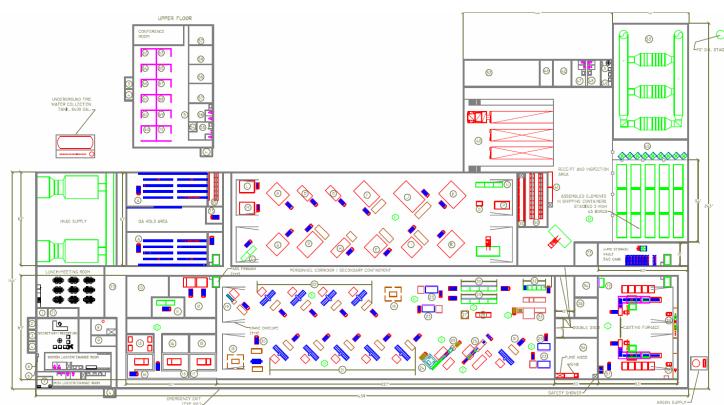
FFC GENERAL ARRANGEMENT PLAN
